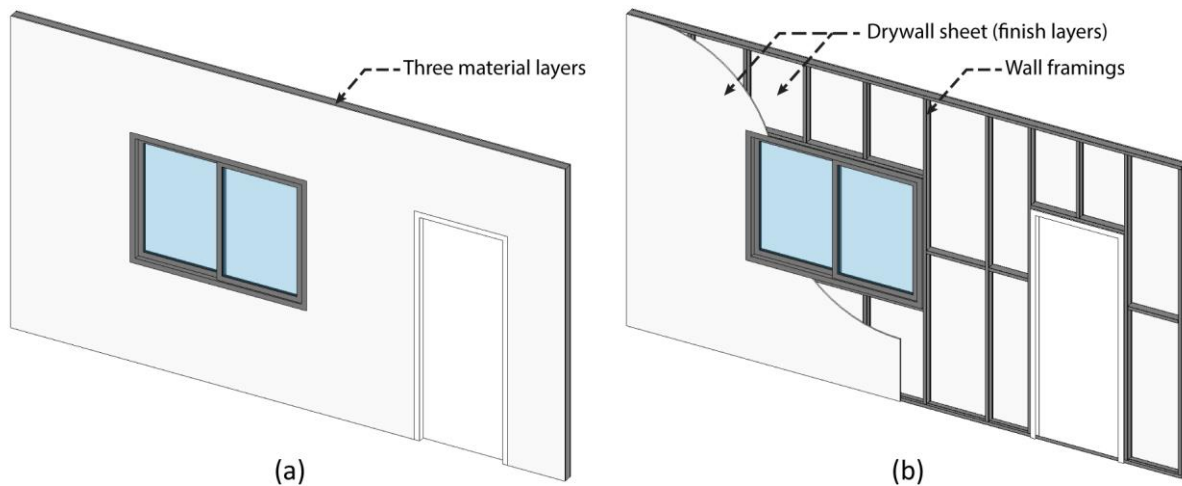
(a) A drywall at LOD 300 has defined material layers. (b) A drywall at LOD 350 has details of wall framings.
